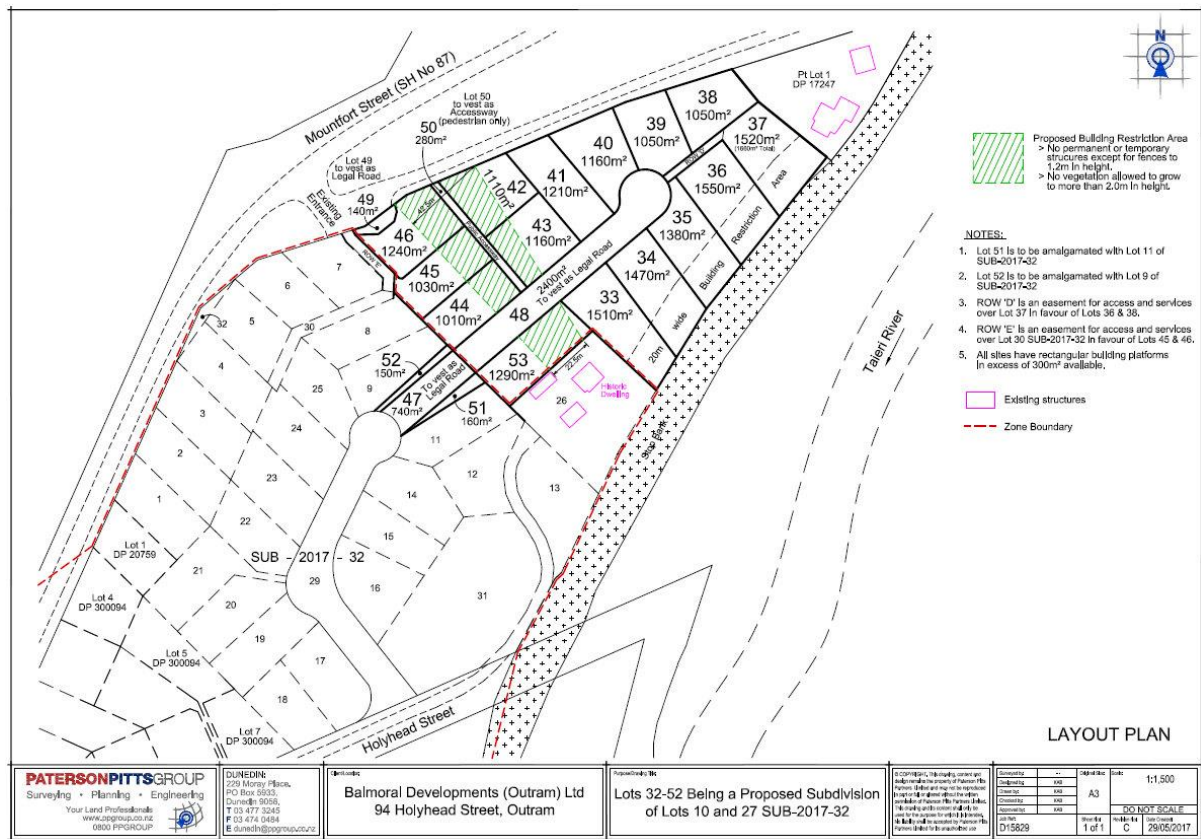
The proposed subdivision plan (Source Paterson Pitts Group).
